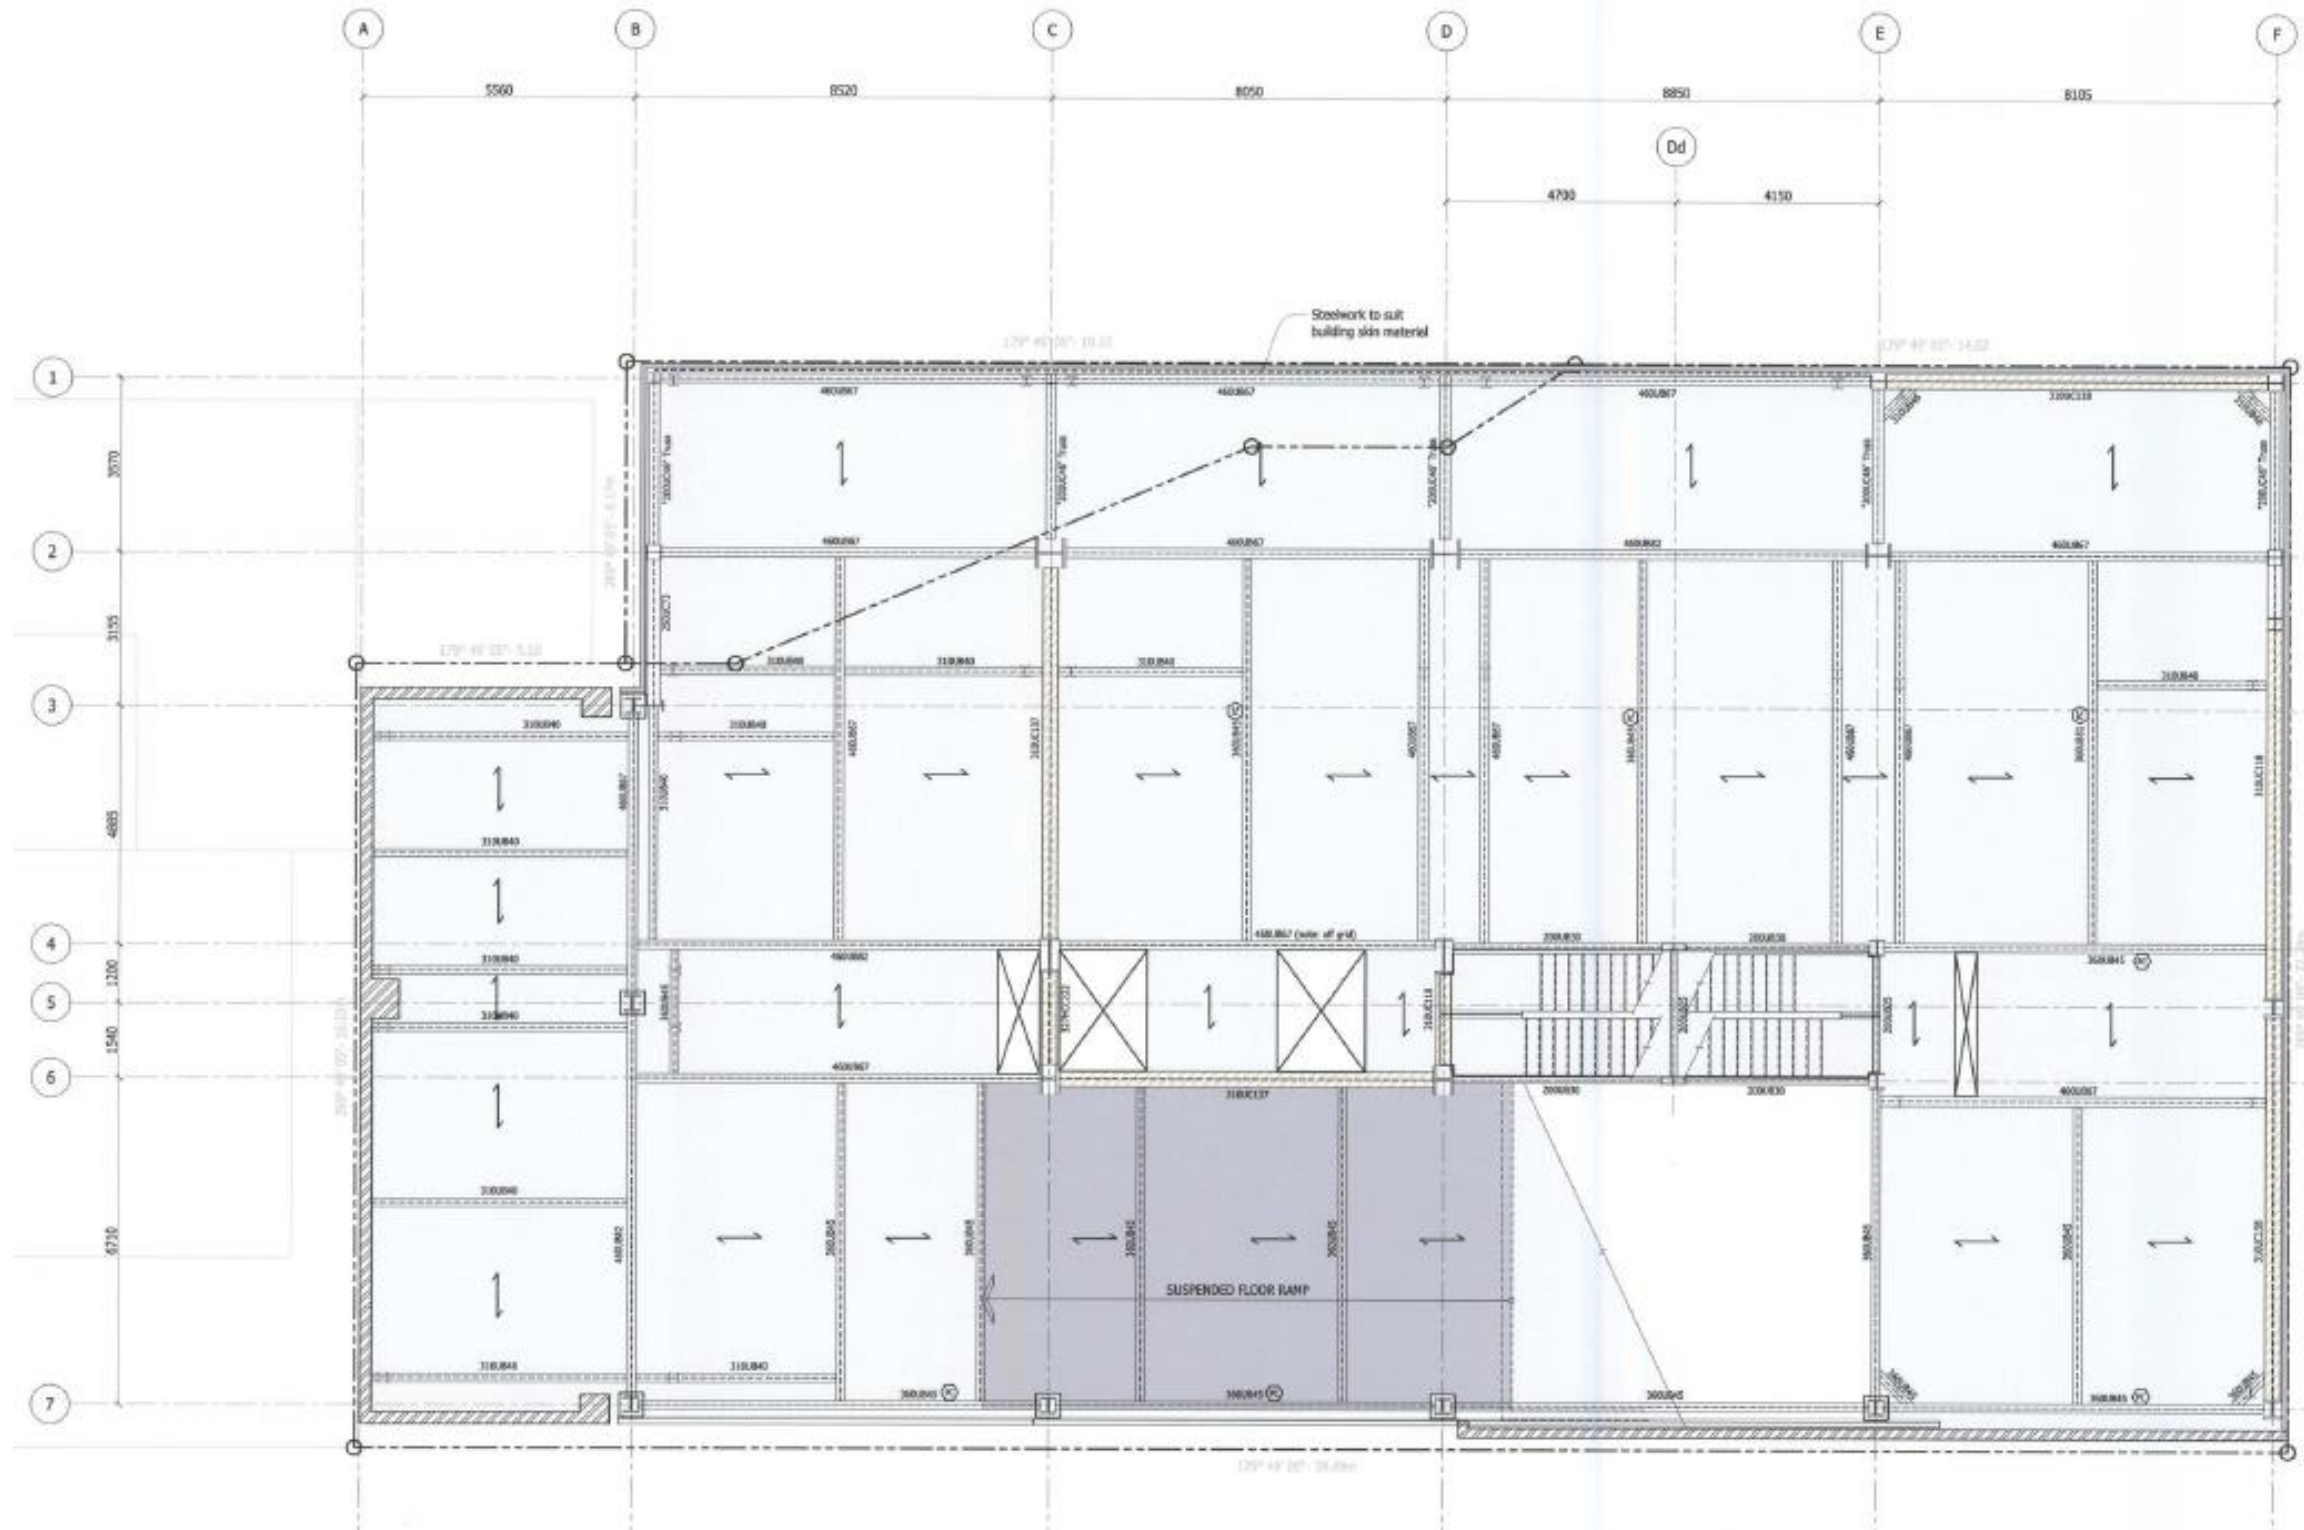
Structural Plan Level 2 (Christchurch City Council 2016c)
